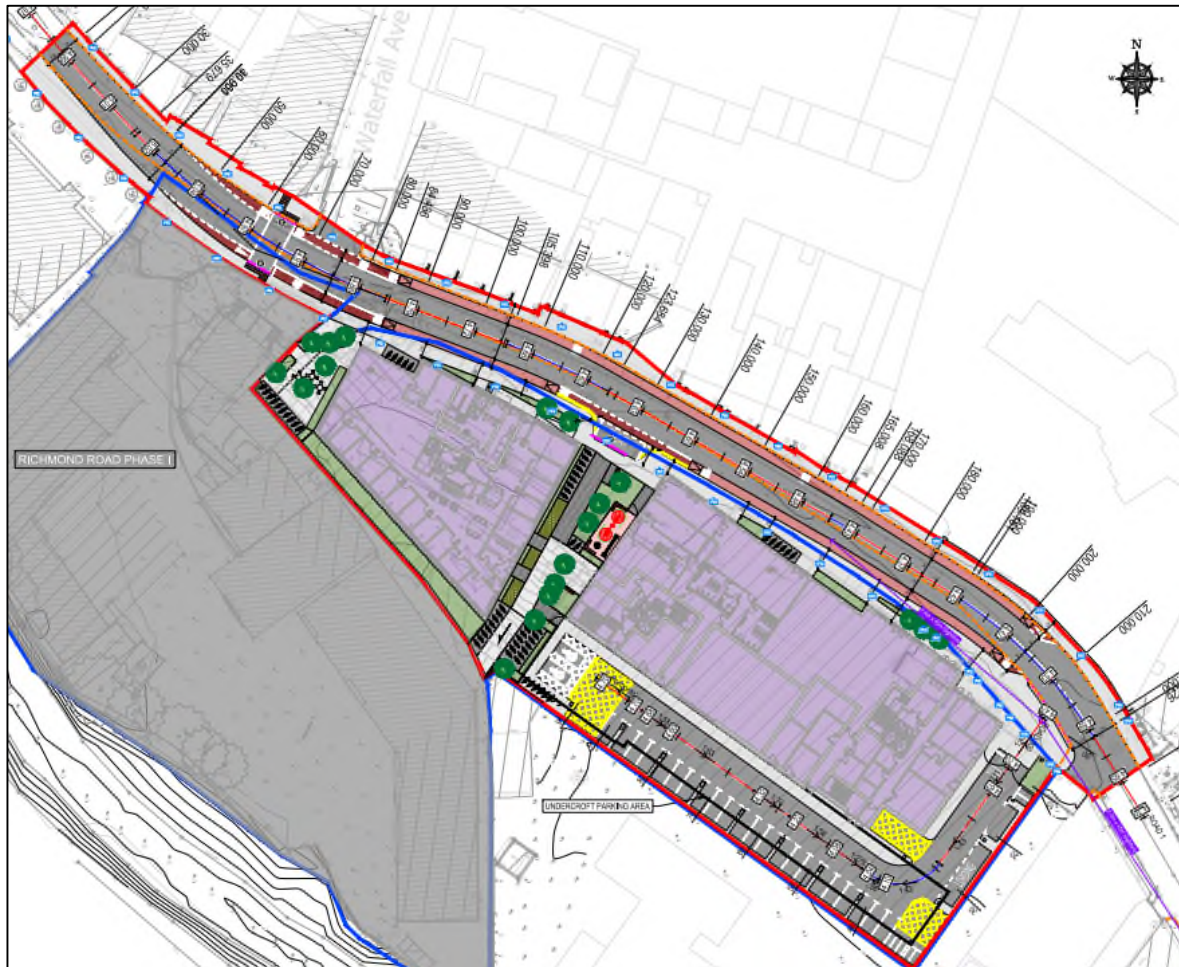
PROPOSED DEVELOPMENT SITE LAYOUT
